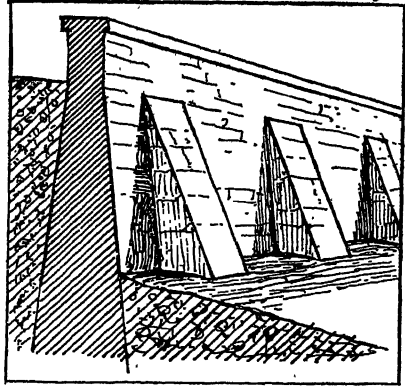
RETAINING WALL BUTTRESSES; SECTIONAL PERSPECTIVE VIEW.
